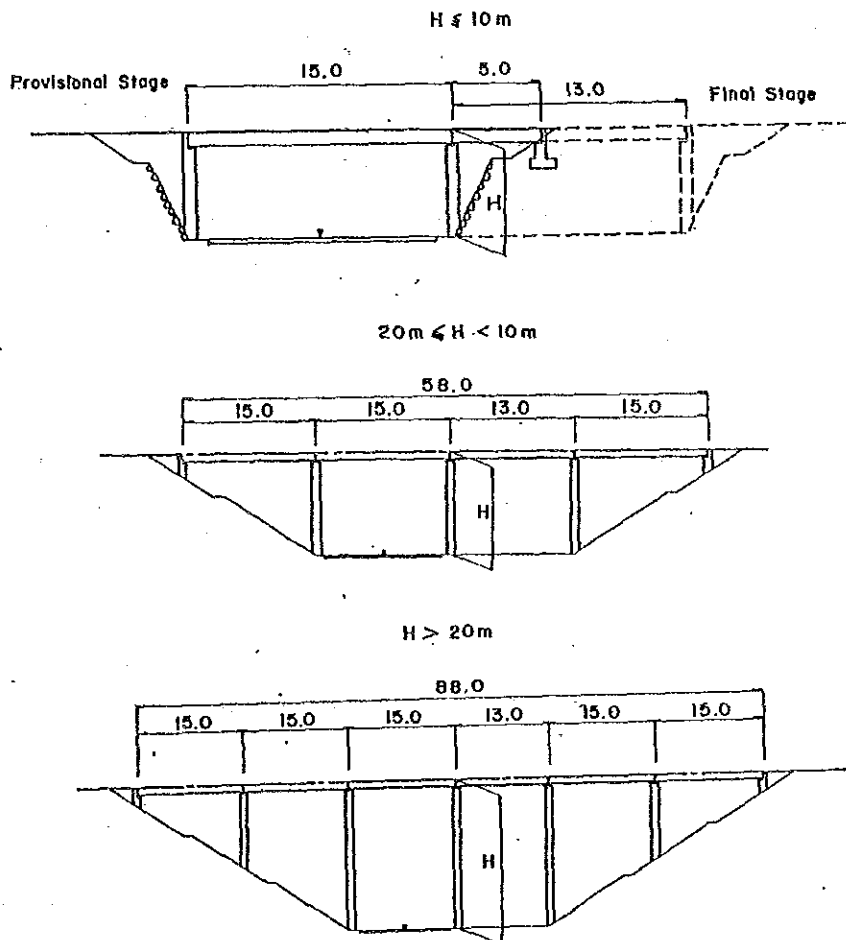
Standard Module of Over Bridge on Staged Construction
